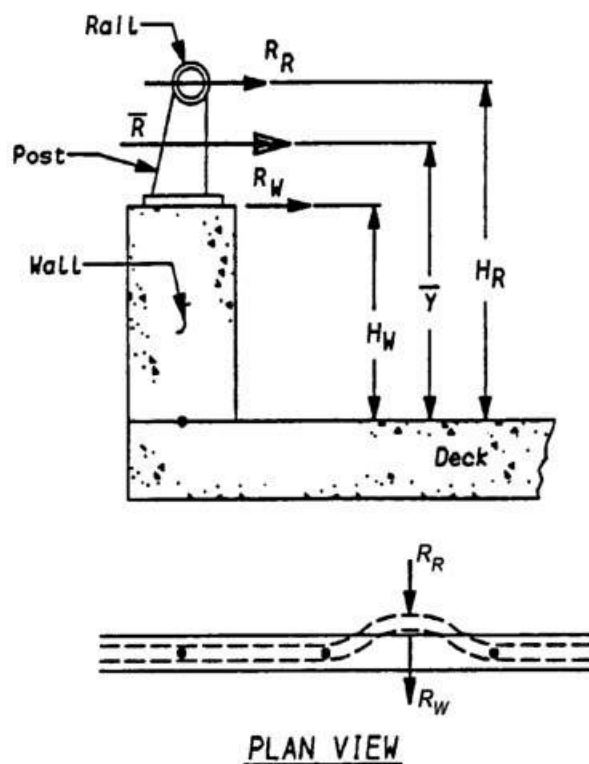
Concrete Wall and Metal Rail Evaluation—Impact at Midspan of Rail
